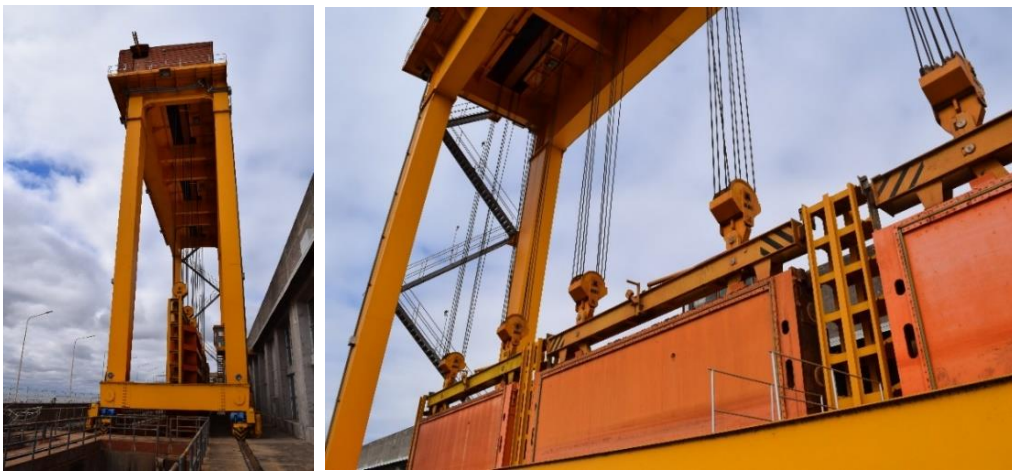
Front and side view of the gantry crane holding the intake emergency gates.
